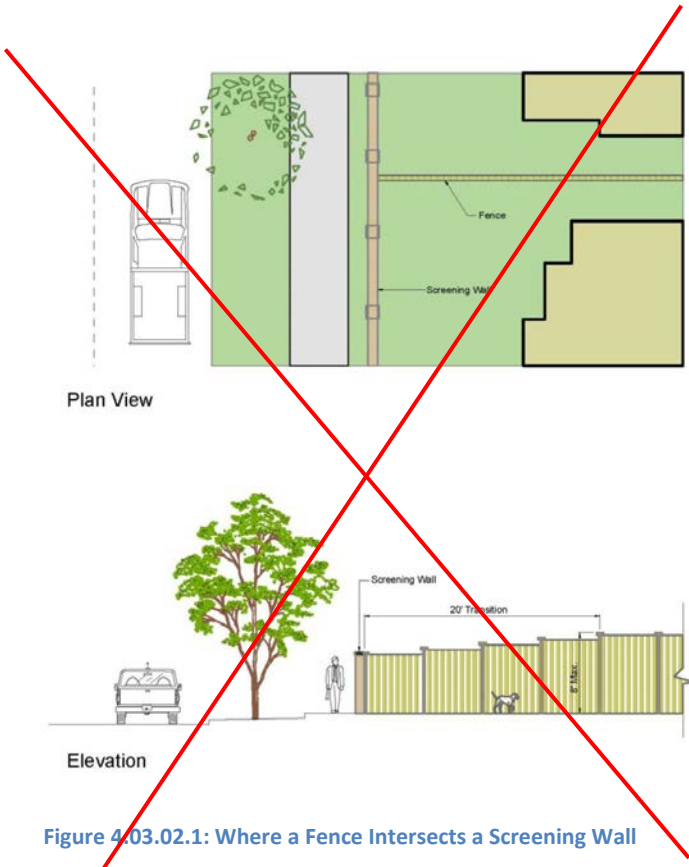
Where a Fence Intersects a Screening Wall
